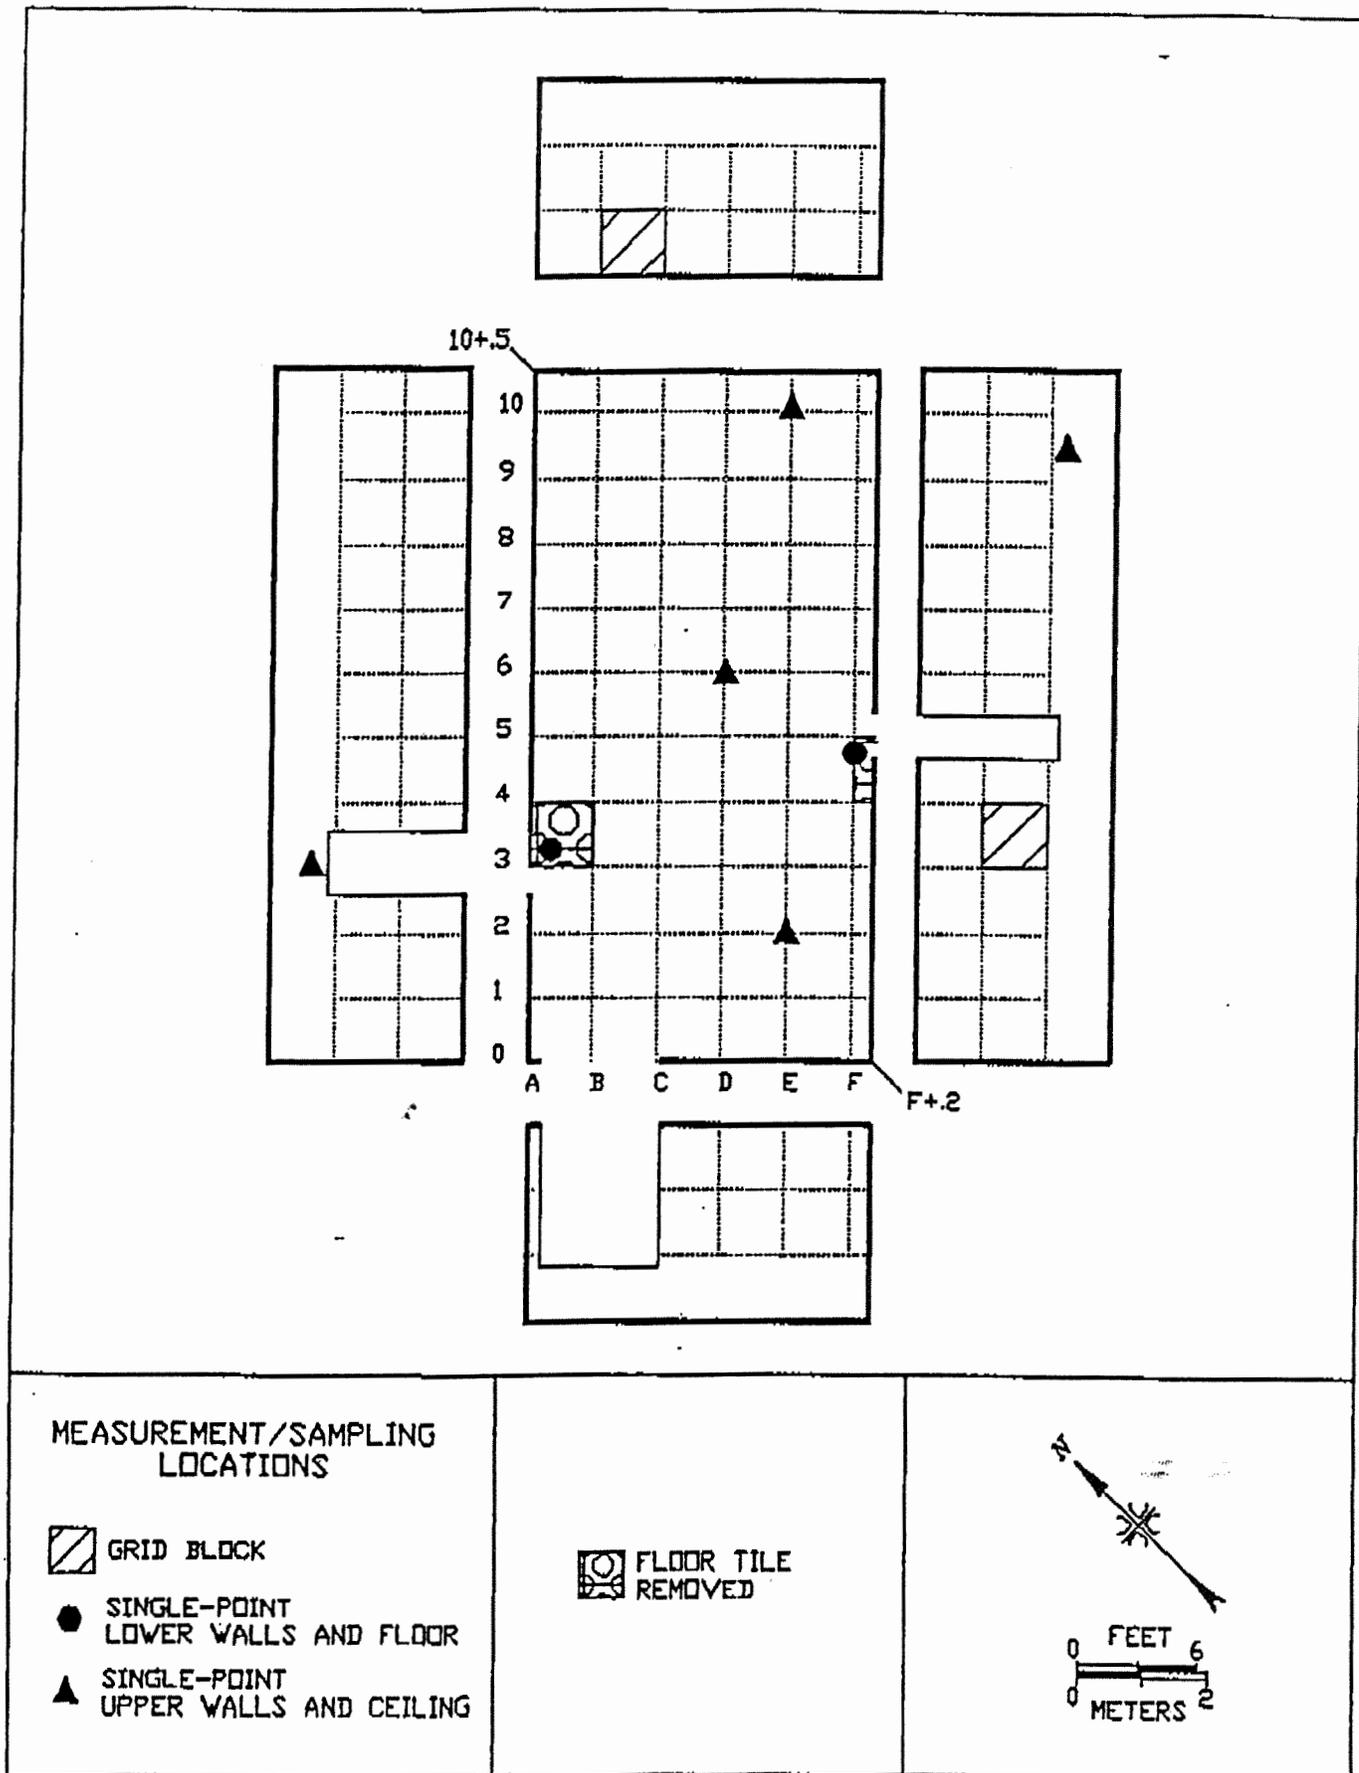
Building 005, Room 113 - Measurement and Sampling Locations
